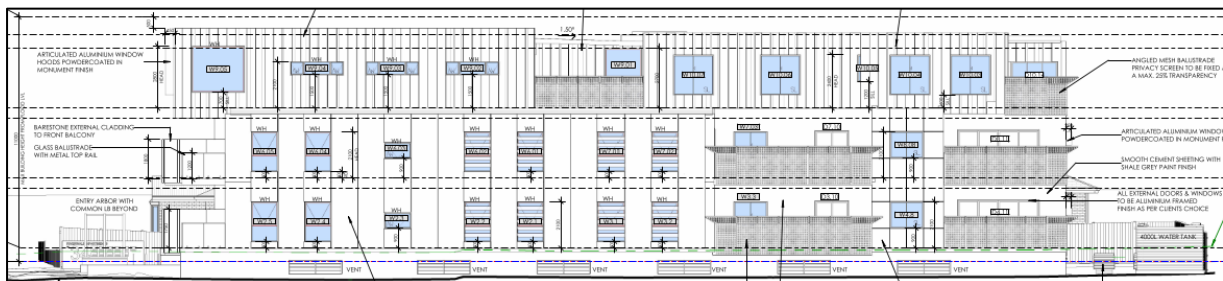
Northeast elevation showing presentation to adjoining land at 32 Barrabool Road. Source: Application documents.
